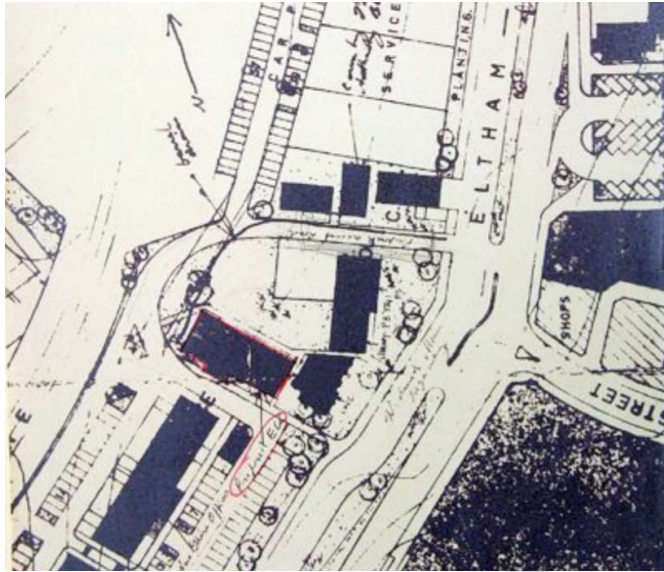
Site plan prepared c.1965, showing location of the proposed Elderly Citizens Centre (outlined in red). (Source: Public Building File No.13712, Unit 1624, VRPS 7882, PROV, cited in Westbrooke 2010:16)
